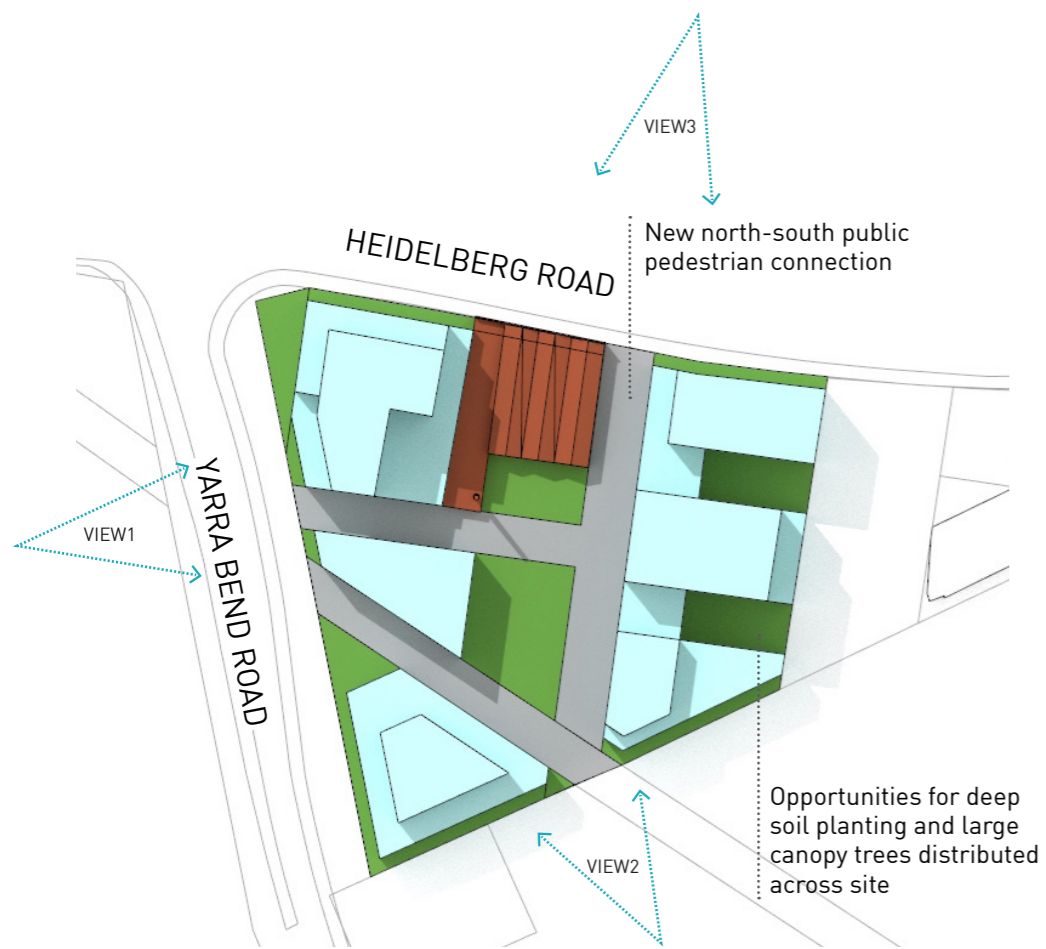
Built form testing - plan view with 2pm shadow at the equinox
